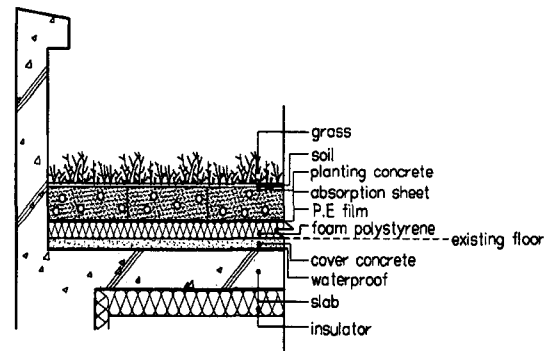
Cross section of roof planting method with planting concrete blocks (existing building)
